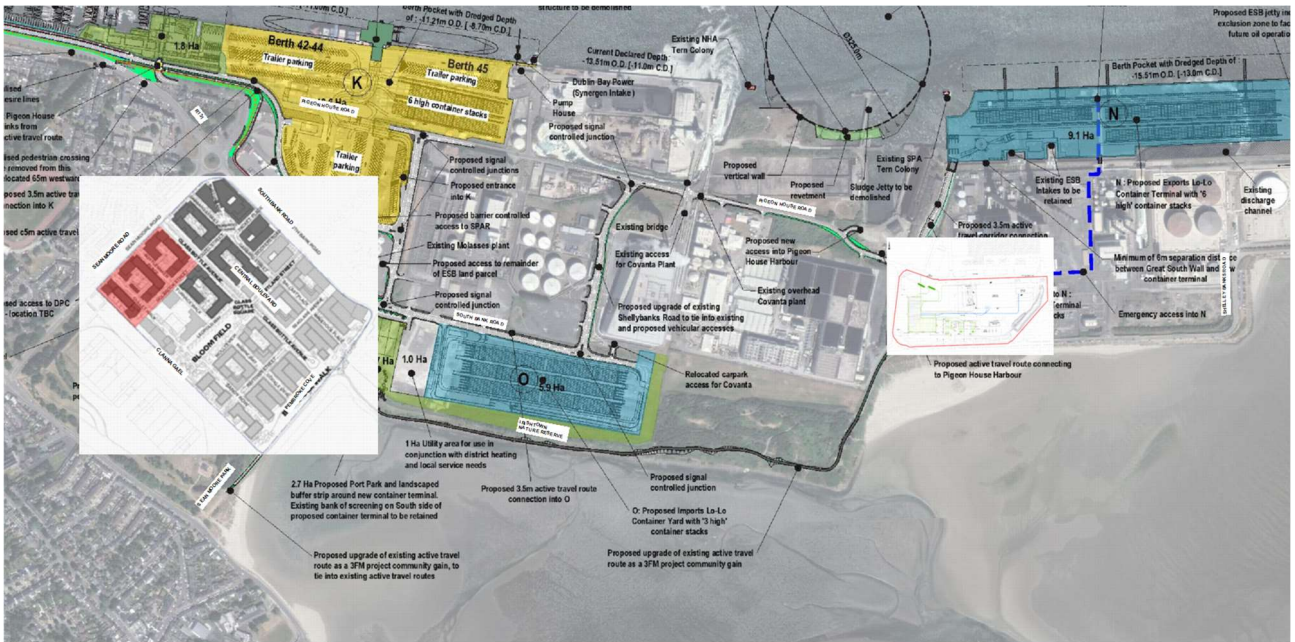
Site plans of the 3FM Project, former Irish Glass Bottle site redevelopment and new Poolbeg GIS
